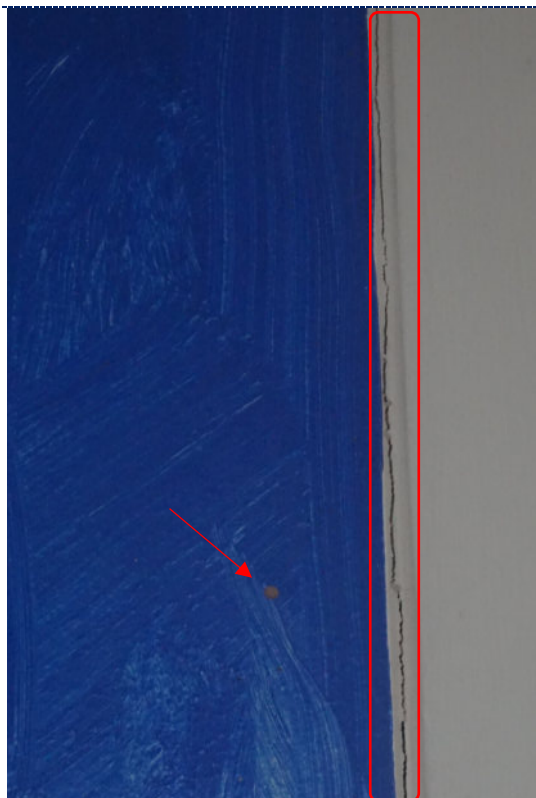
Section 3 – Detail – surface accretion and elongated crack.
